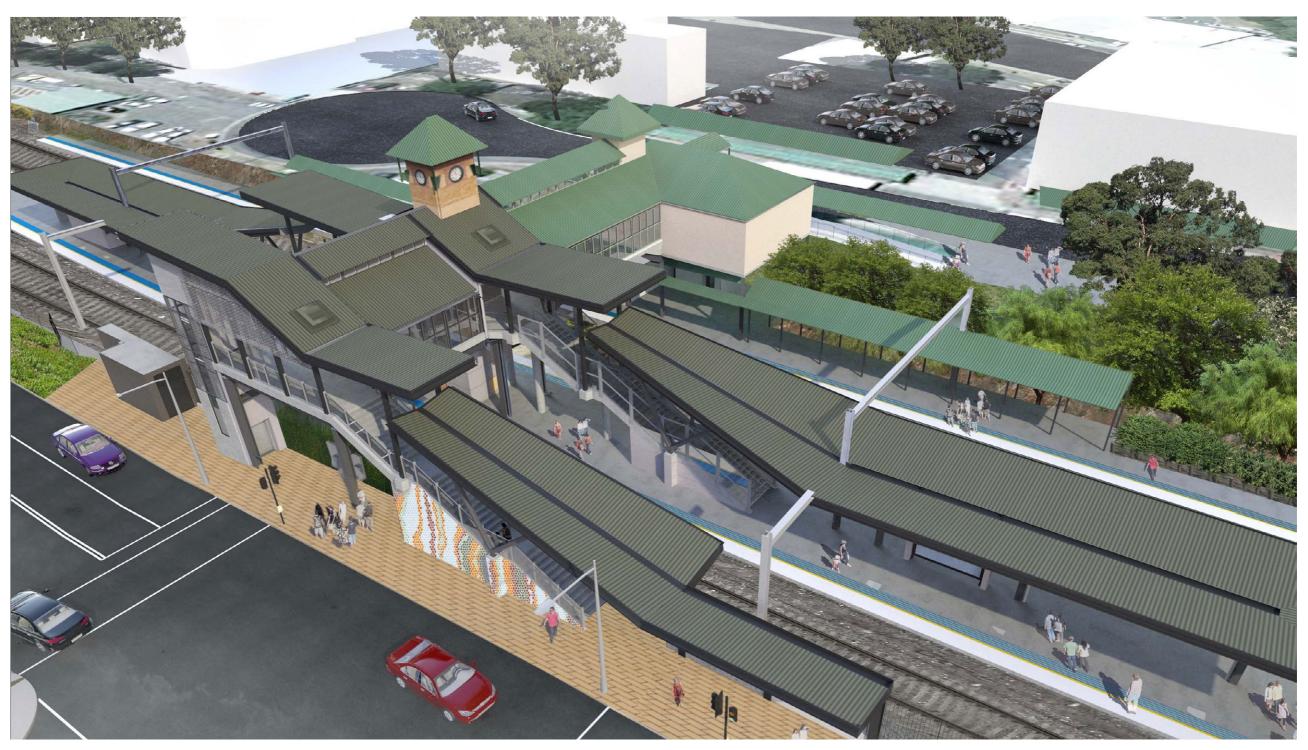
Extensions to existing station building Pennant Hills (aerial view)
